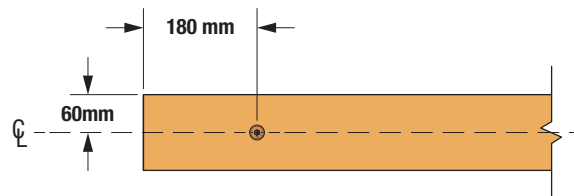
MTLD Fastener Located on a Beam with a Minimum End Distance = 180 mm and Minimum Edge Distance = 60 mm
